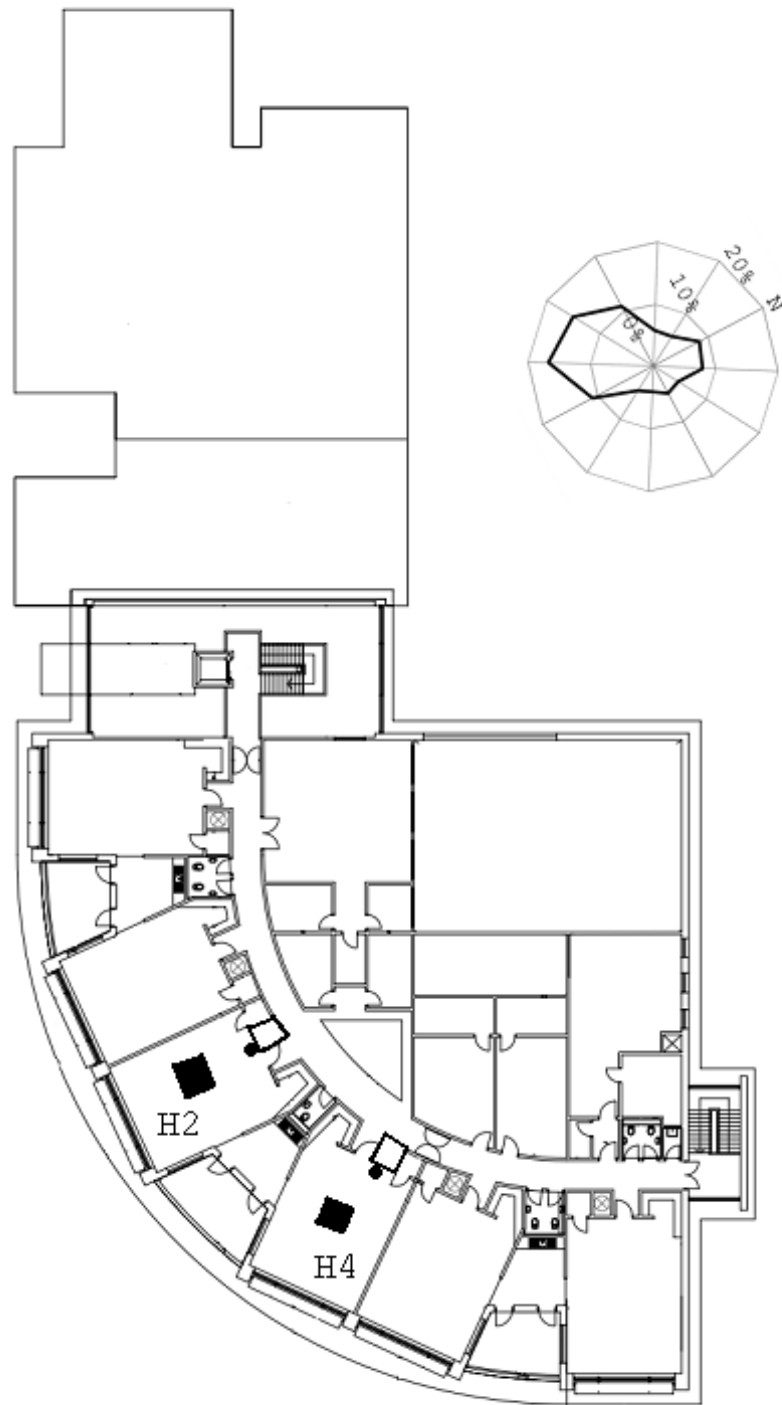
School H, plan view, first floor. H2 and H4, floor area 52.22 m².
